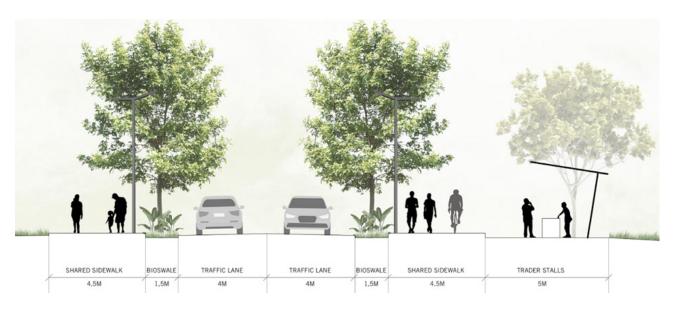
A 25 m Complete Street with Trader Facilities (Example)
